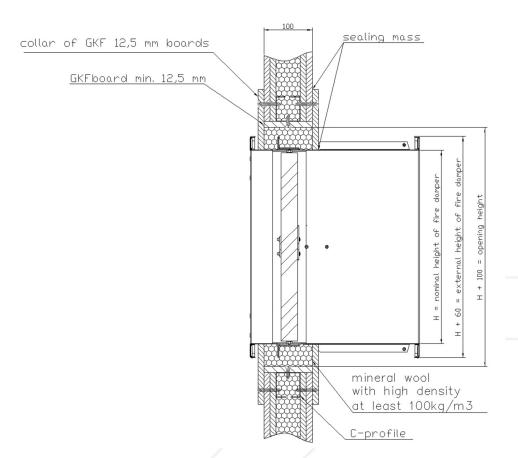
Installation method of fire dampers KWP-L in flexible wall 100 mm thick
